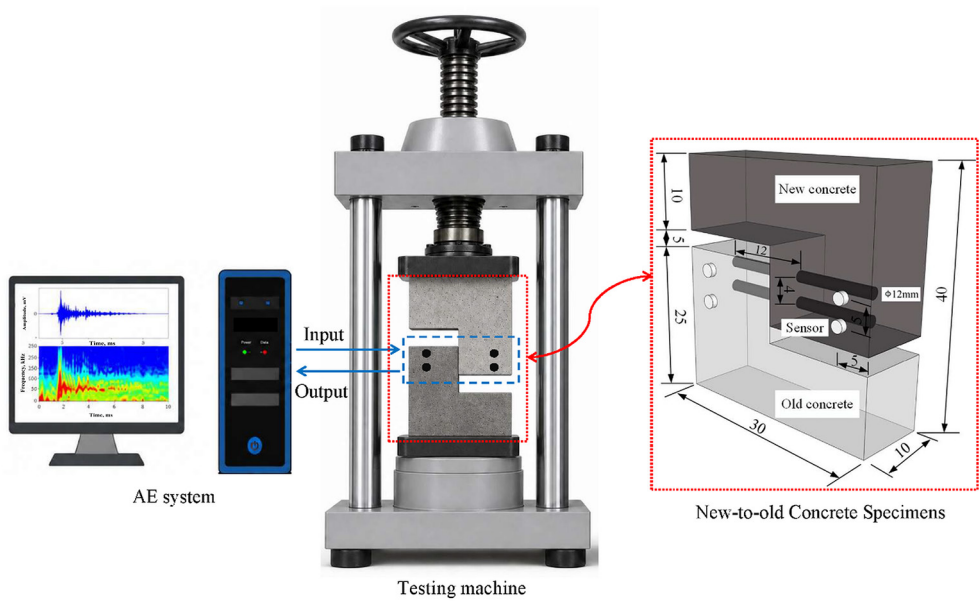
Testing equipment and New-to-old concrete specimens, dimensions in cm
